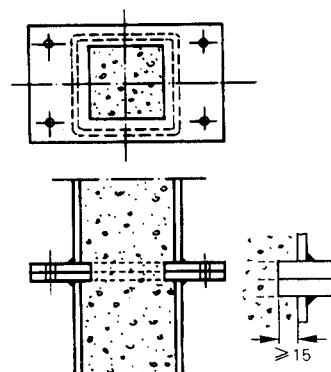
Steel plates welded to the open ends of the column and then bolted together
